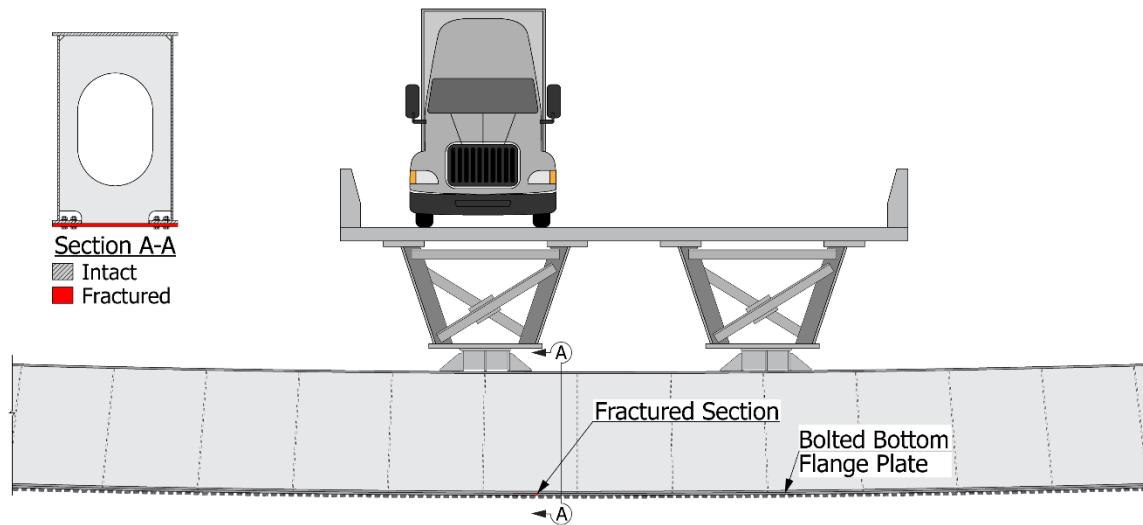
Design Concept B: steel box straddle cap with cross-boundary separation limits the extension of the cracks only to the bottom flange plate
